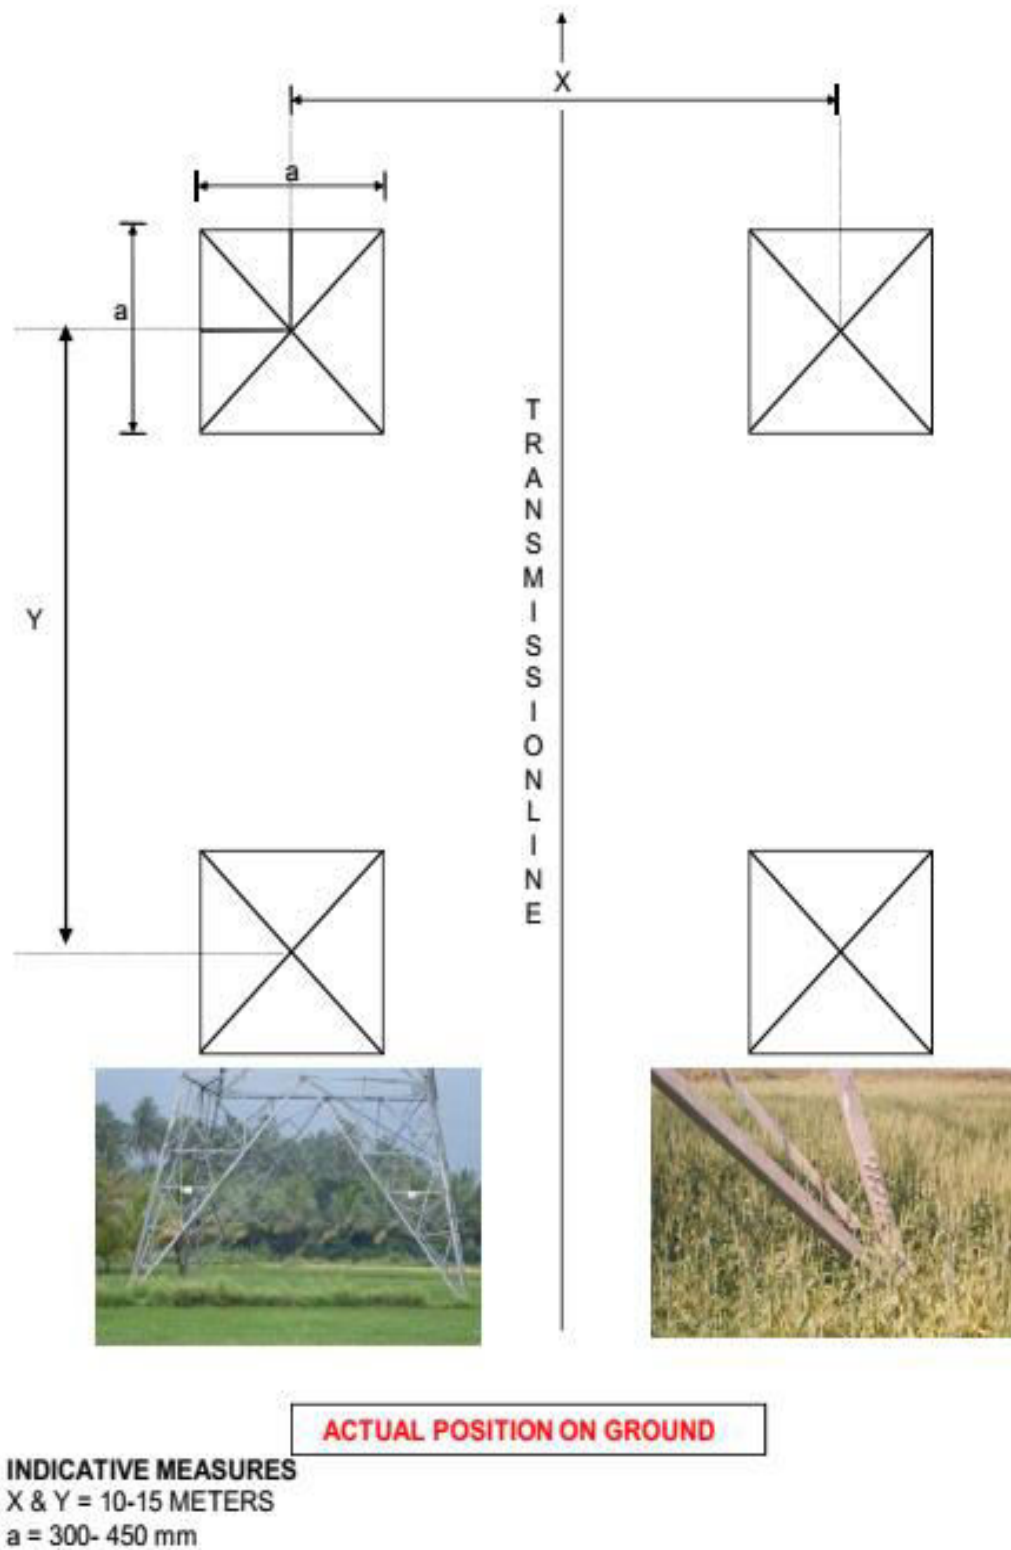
Typical Plan of Transmission Line Tower Footings Showing Actual Ground Position and Extent of Impact
